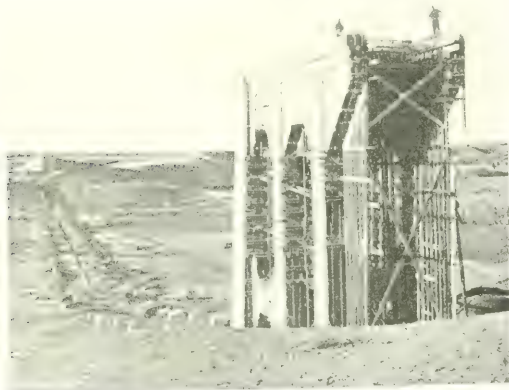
East Abutment and Foundations for the entire Bridge.
